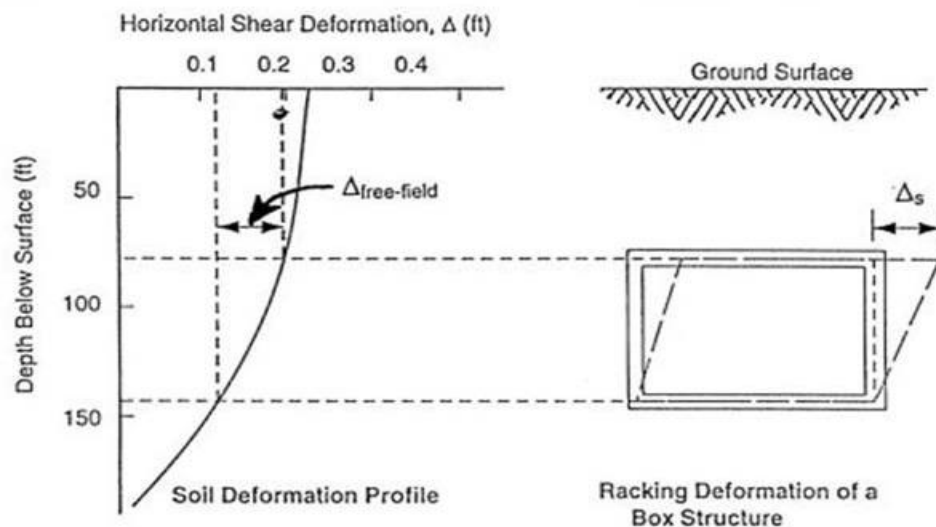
Soil Deformation Profile and Racking Deformation of a Box Structure
